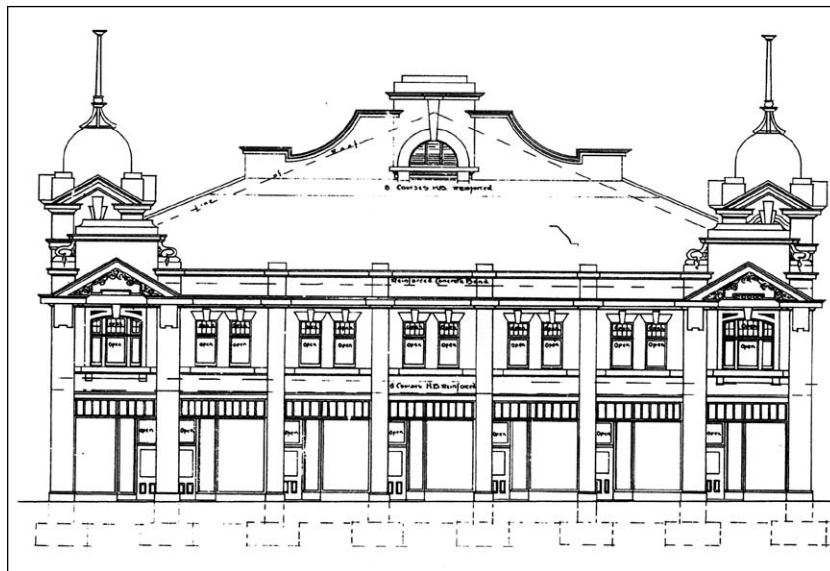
1914 Collins St elevation (HCC Drawing A7⁶).
